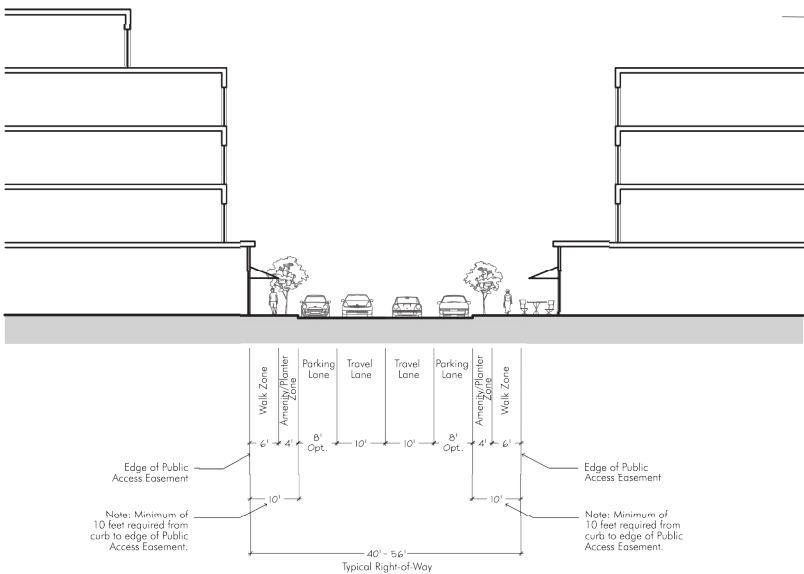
Typical Flexible Connection with Vehicle Access Section (H-H)
